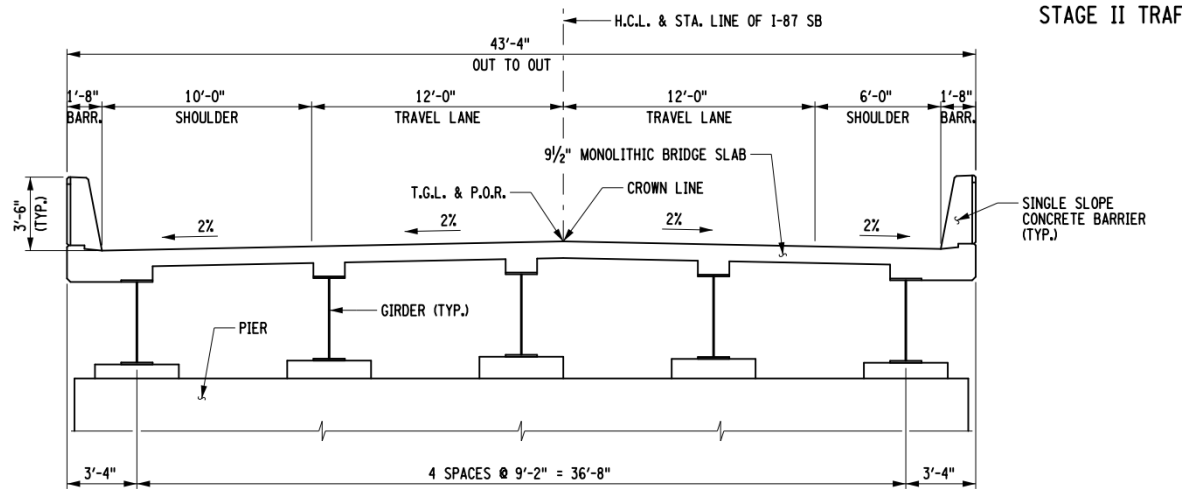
Proposed cross section I-87 S.B. over Meigsville Rd.
